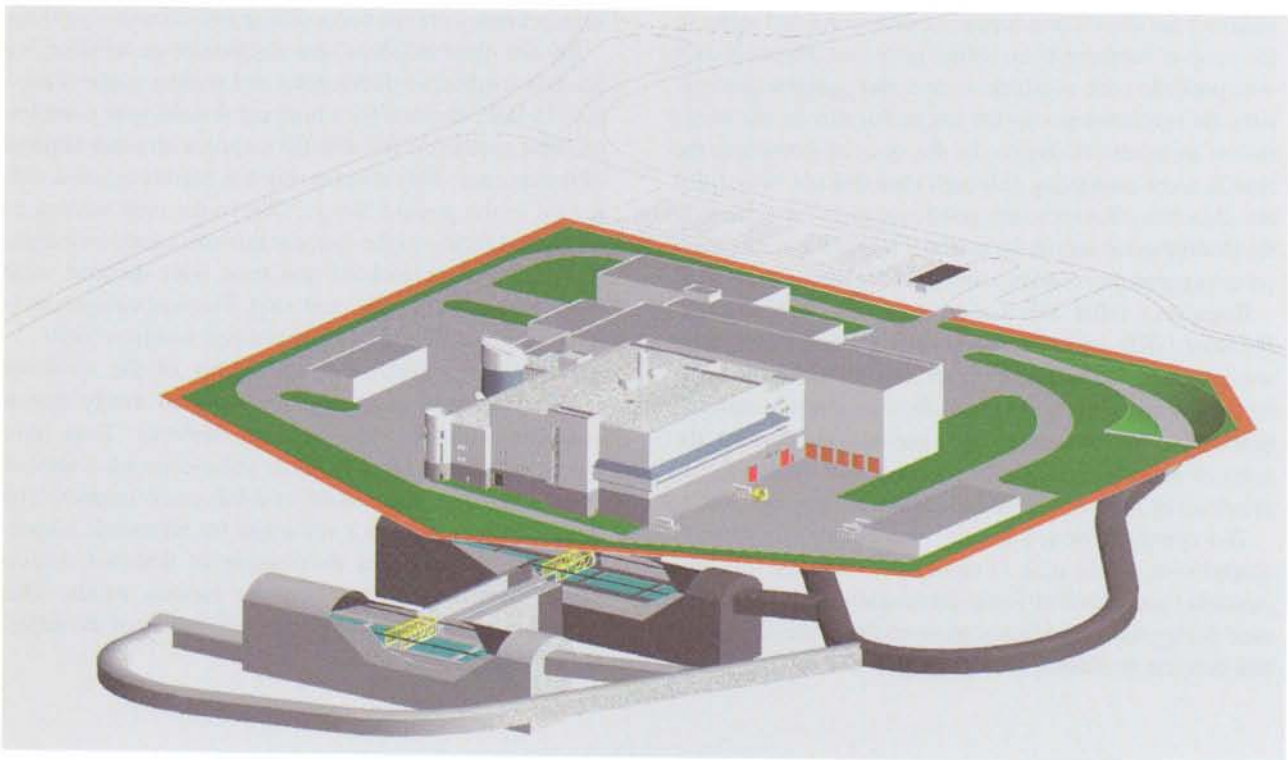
Overview of the planned encapsulation plant adjacent to the CLAB facility.
